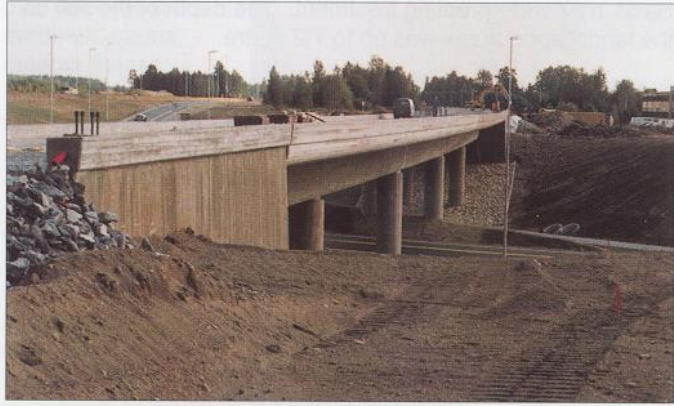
KVERNDALEN BRIDGE, NOOSDLO
